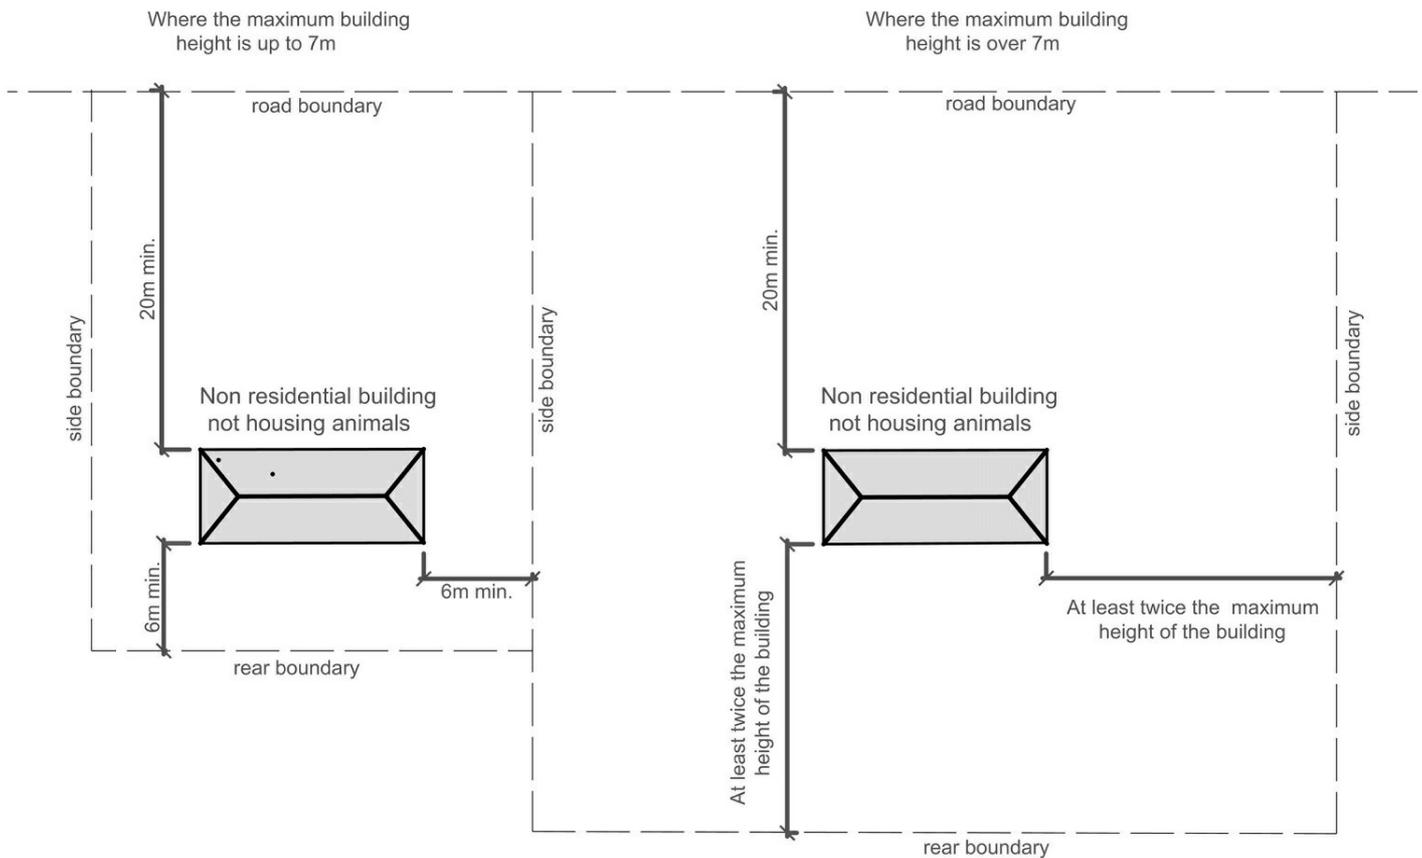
C: Setbacks for non-residential buildings not housing animals
